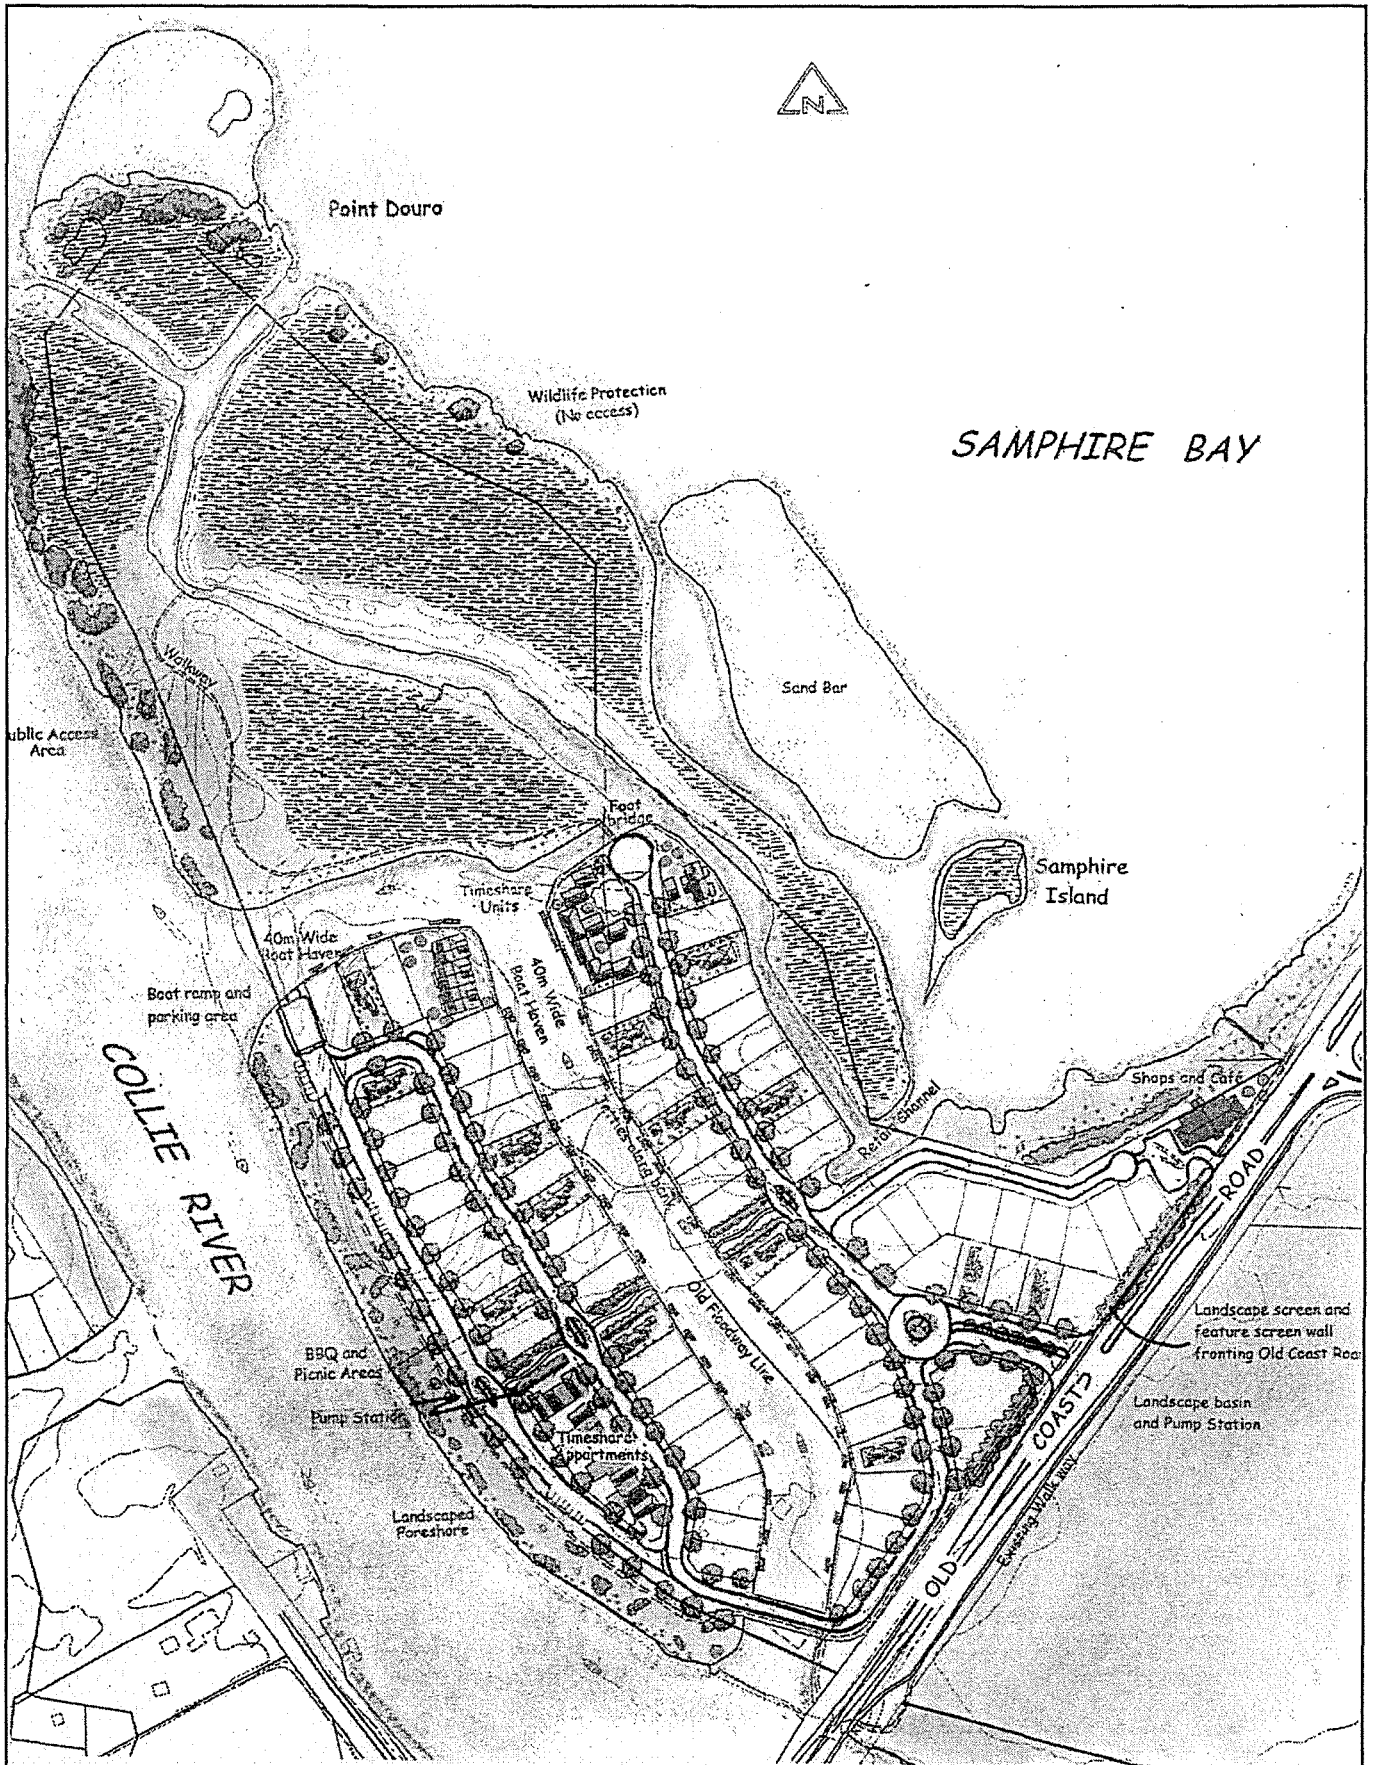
Concept Development Plan (01) as originally proposed under Amendment No. 13
